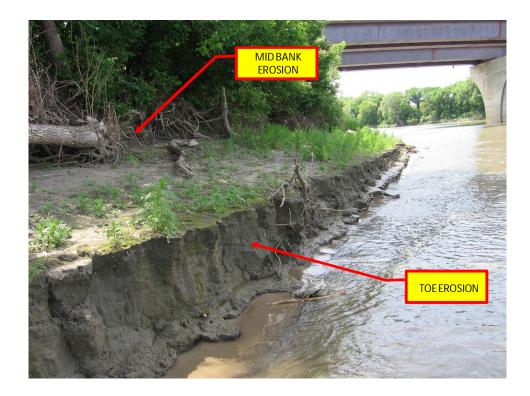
Toe and mid bank erosion on east bank facing (upstream) south.
